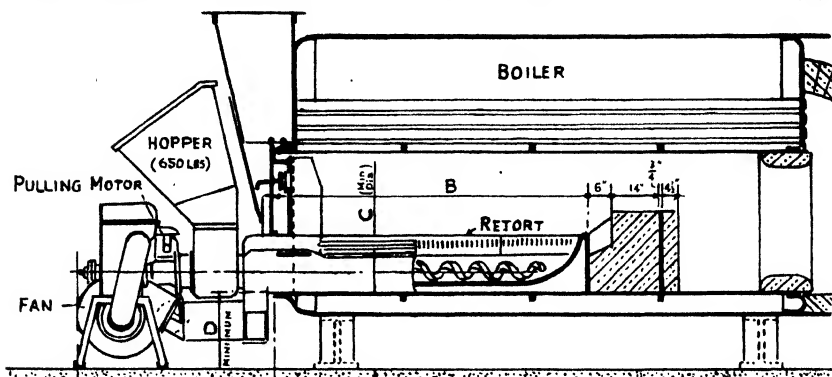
A. SCREW TYPE UNDERFEED STOKER (HOPPER TYPE)
